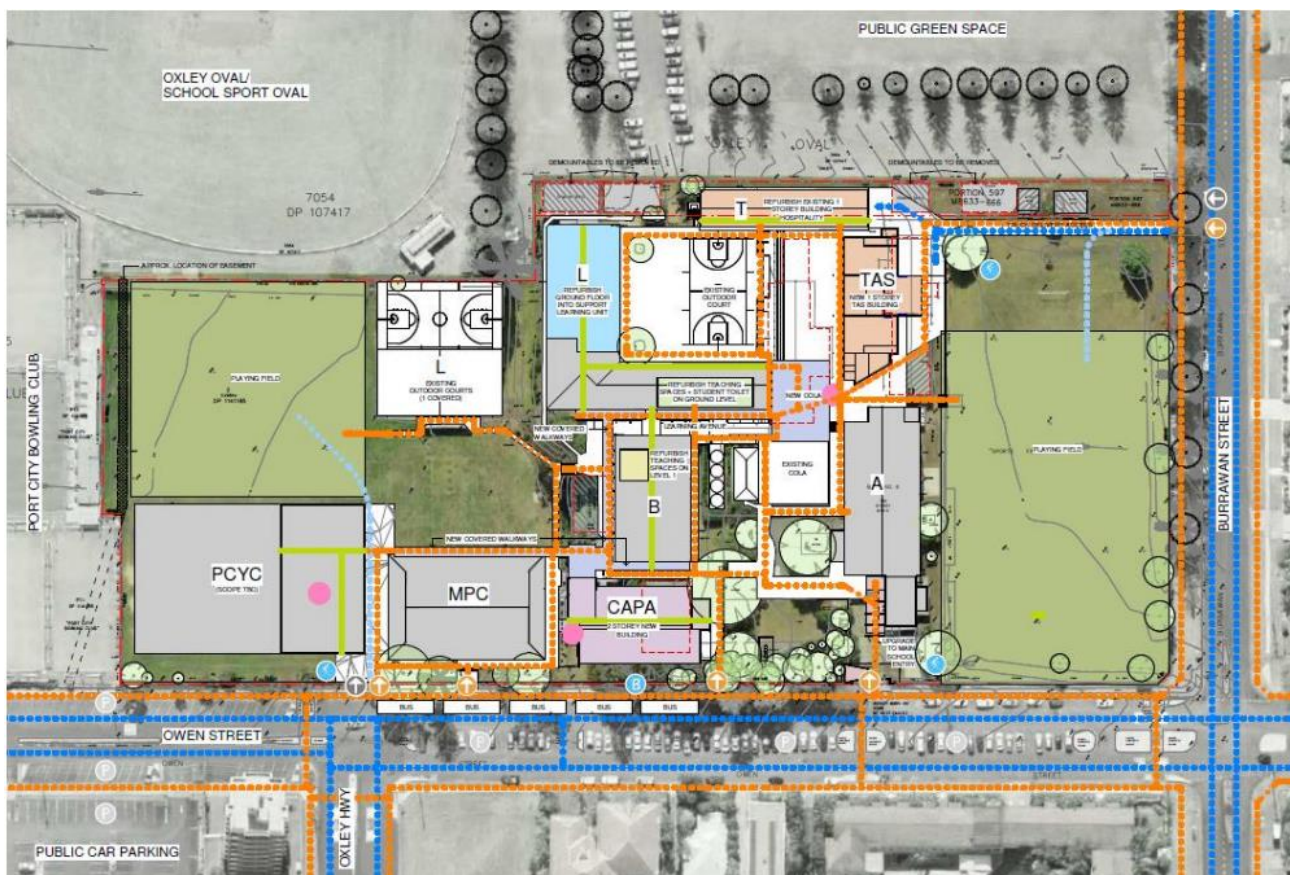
Site Plan (Source: EIS Report, 25 May 2021, DFP Planning)
